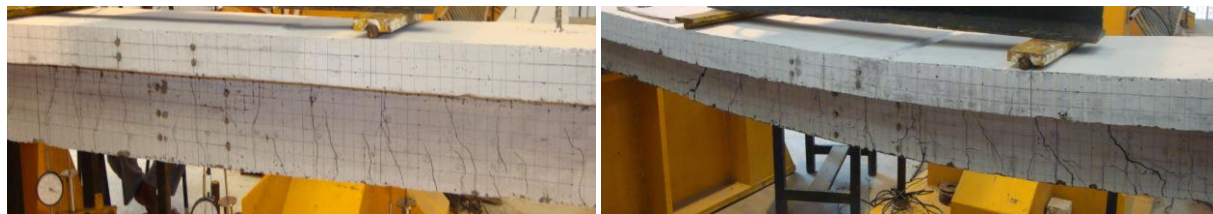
Flexure Test of Flanged Beams under Static Loading Condition
